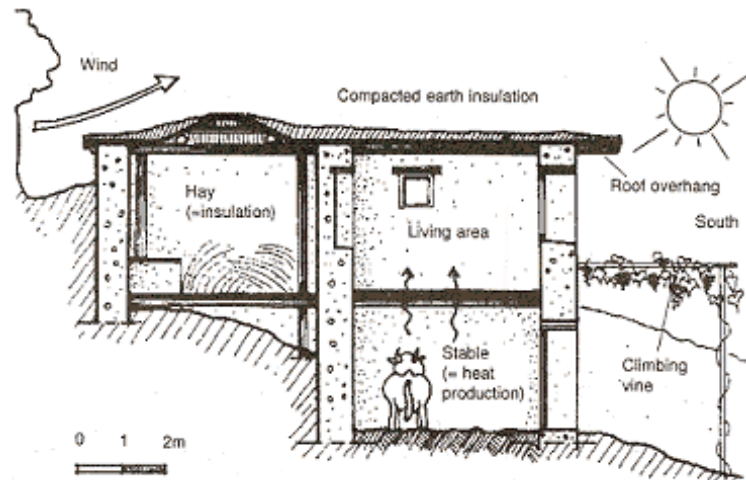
Rooms for cattle and livestock on ground floor to provide additional heating
